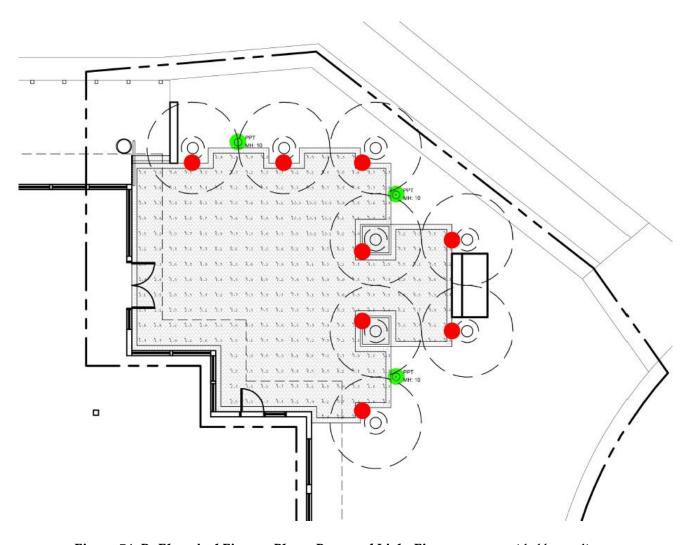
A-B: Electrical Fixture Plan + Proposed Light Fixtures, as provided by applicant.
